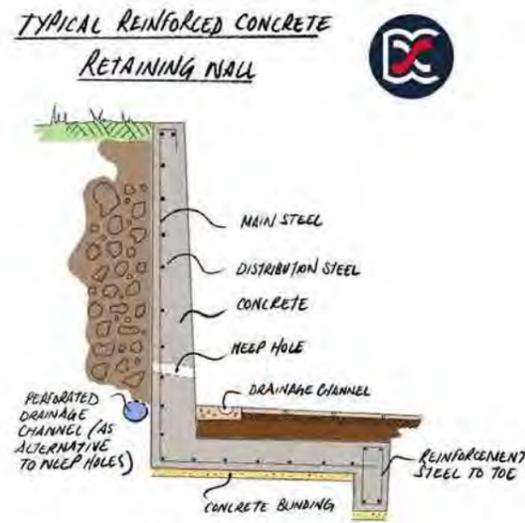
Typical section through reinforced concrete cantilever retaining wall
